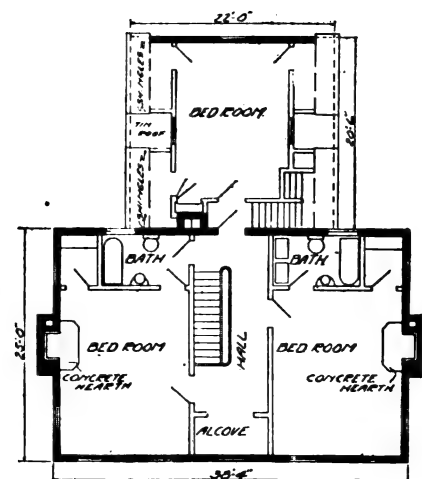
SECOND FLOOR PLAN, MASSEY HOUSE
